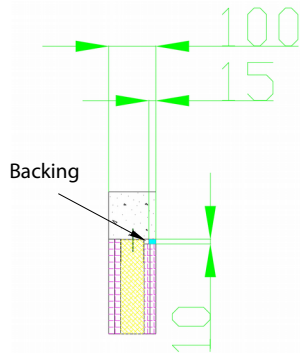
wall gypsum to stone thickness ≥ 100 mm
